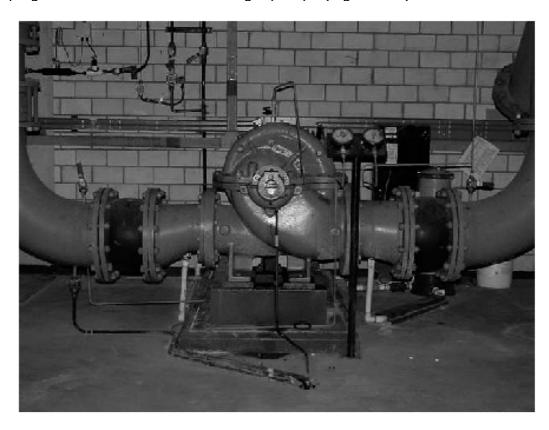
Typical Piping Layout Associated with a Horizontal Centrifugal Pump
